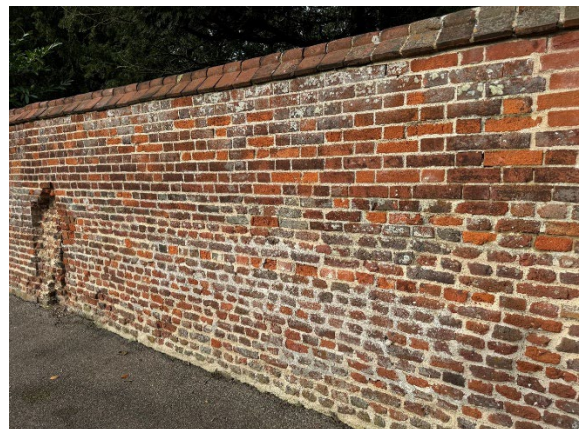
Brick wall, Heydonbury, Heydon Lane, detail of older brick wall
